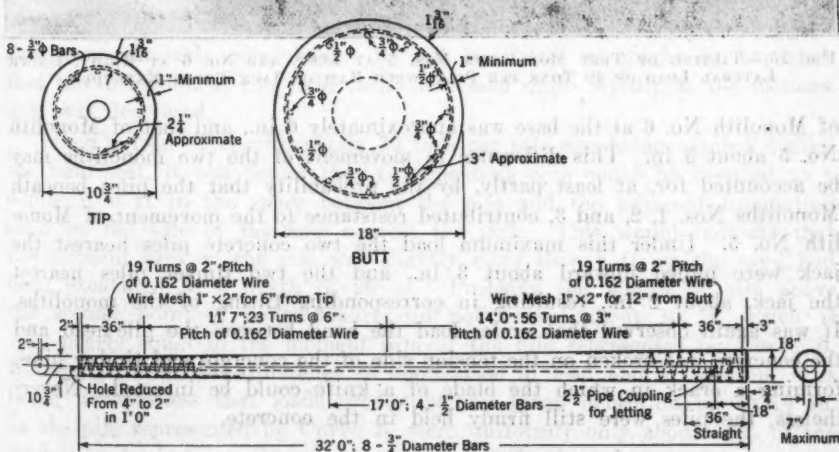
DETAILS OF CONCRETE TEST PILE.
